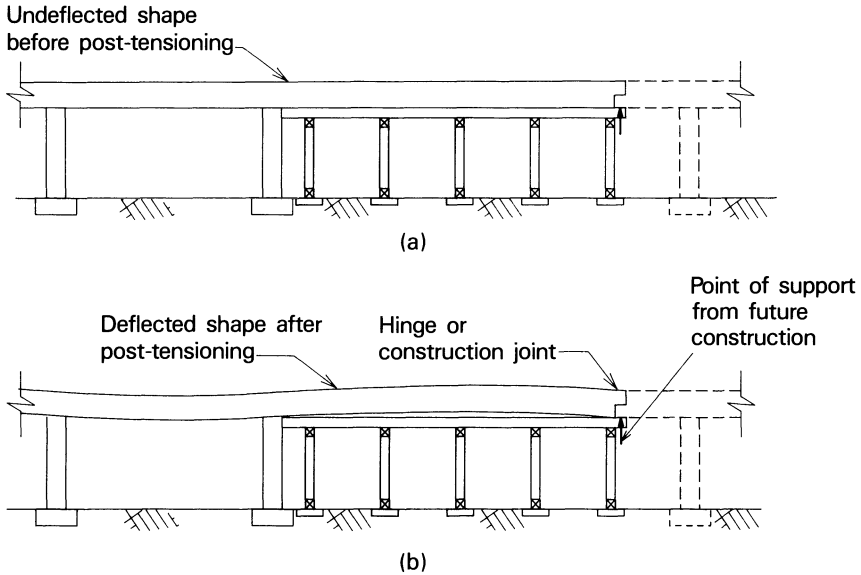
Cast-in-place prestressed-concrete bridge with an in-span hinged or construction joint. (a) Before prestressing with all shores supporting load. (b) After upward deflection due to prestressing and a large reaction being supported by the falsework bent at the joint.
